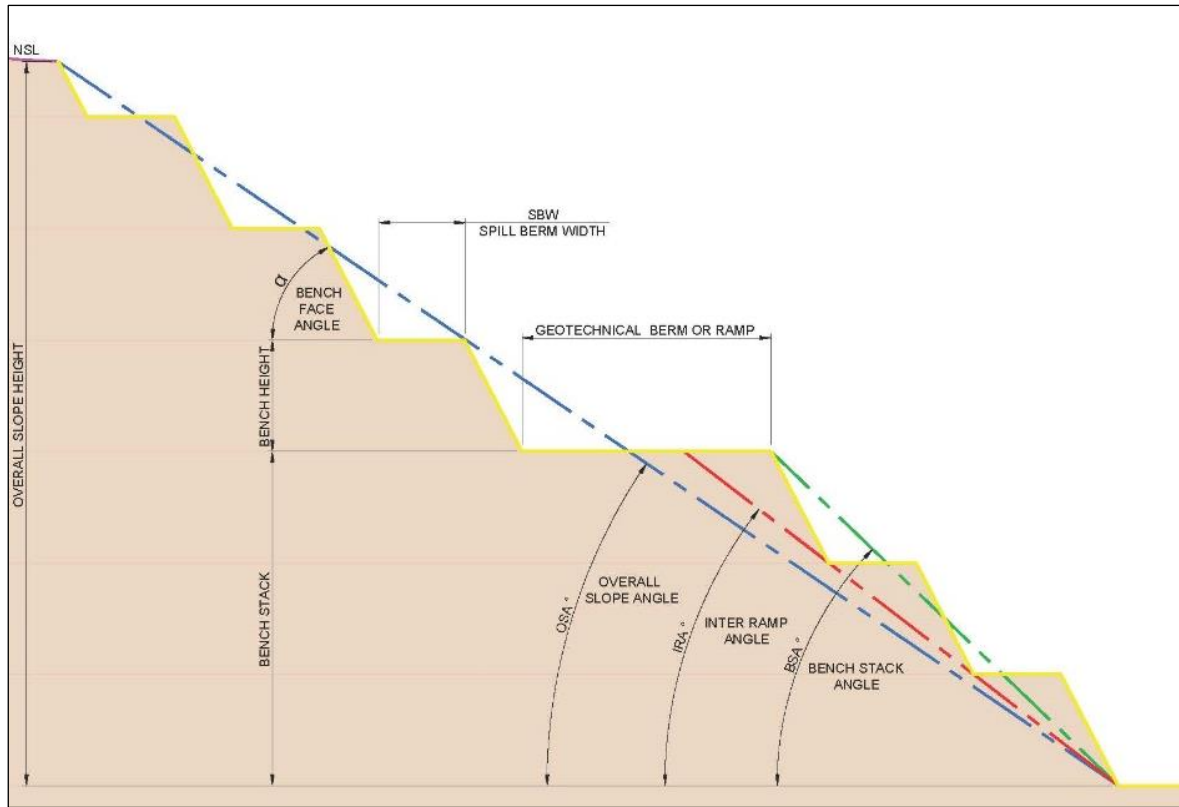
Pit Slope Design Elements, Geometries, and Terminology
